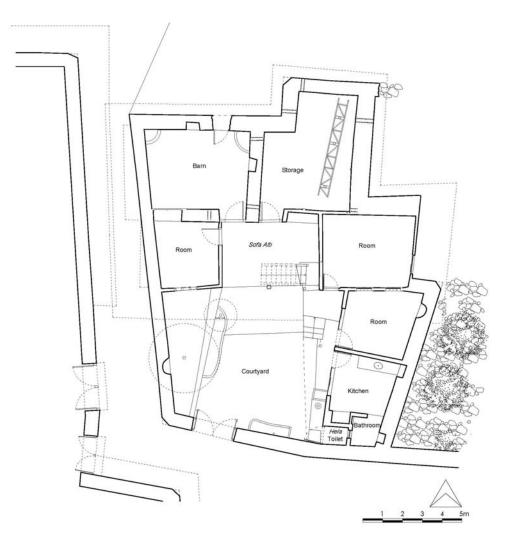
The plan of the ground floor of Kaçıklar House. (Source: Kenar et al. 2019)
